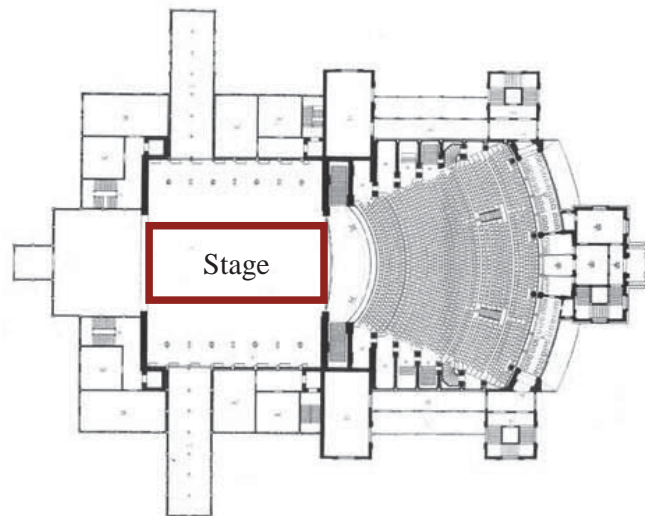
FESTSPIELHAUS GROUND PLAN BY (SACHS, 1898)
